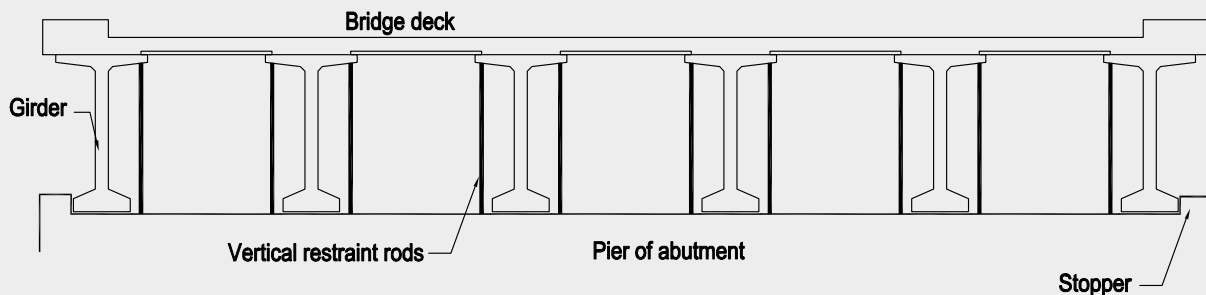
Bridge section showing recent construction practice that eliminates the transverse diaphragm and uses vertical steel rods to prevent overturning.
